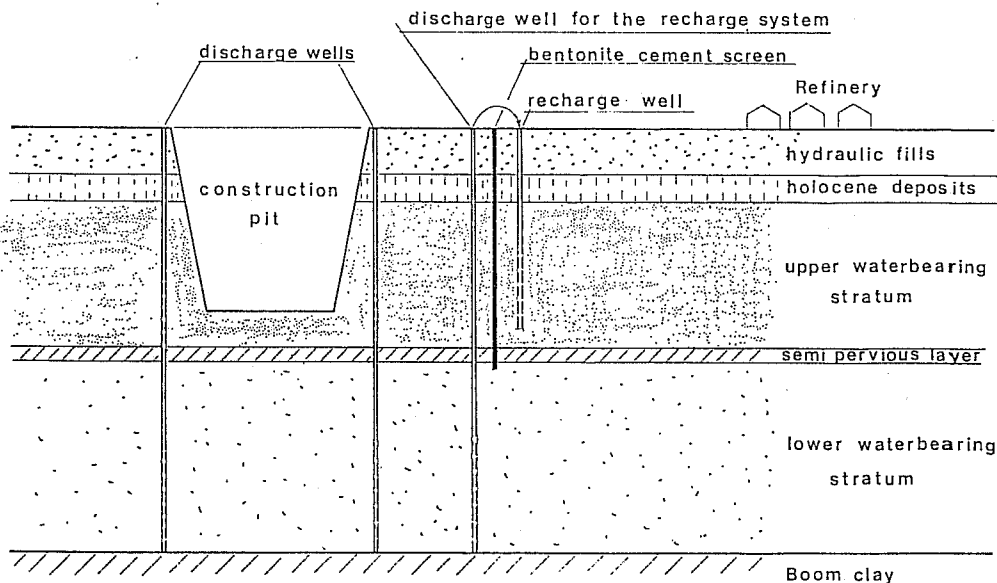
Berendrecht : schematic cross-section of the groundwater recharging system and of the groundwater lowering system for the construction of the new sea-lock
